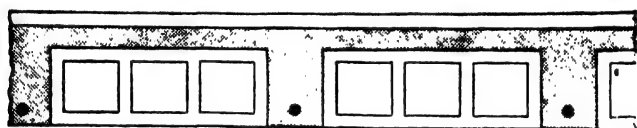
U.K. Terra-Cotta and Reinforced Concrete Floor.
